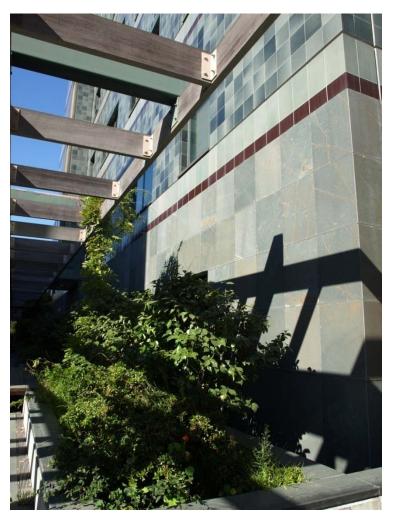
Landscaping strip restricts pedestrian access adjacent to adhered veneer façade. Larger units used within lower 6 feet; smaller units used above (Photo courtesy of Cynthia Perry, BFP Engineers).
